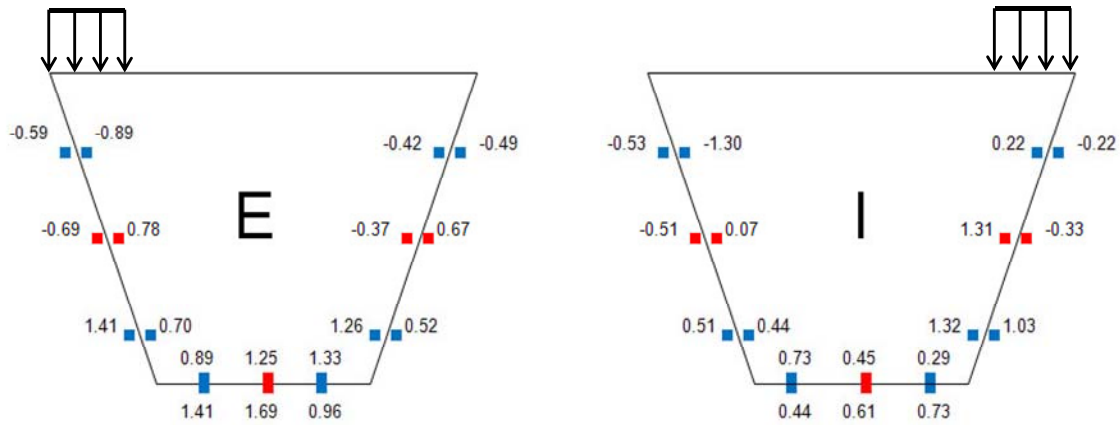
Stress Changes due to West Rail (ksi) Section B
